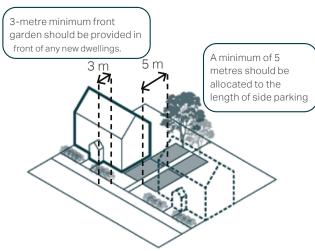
Illustrative diagram showing the indicative layout of and minimum dimensions of on-plot side parking, parking bays should be set slightly behind main building frontage to minimise visual impact on streetscapes.
